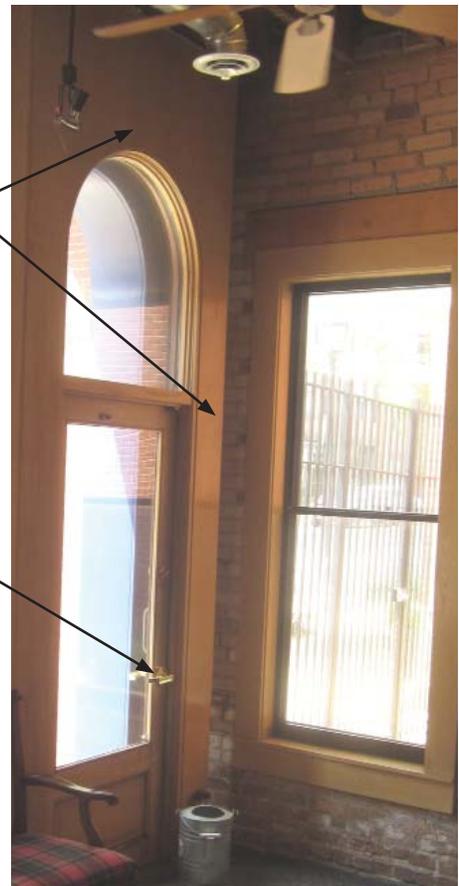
PHOTO SET 'F' - Existing non-original doors facing 1st St N
